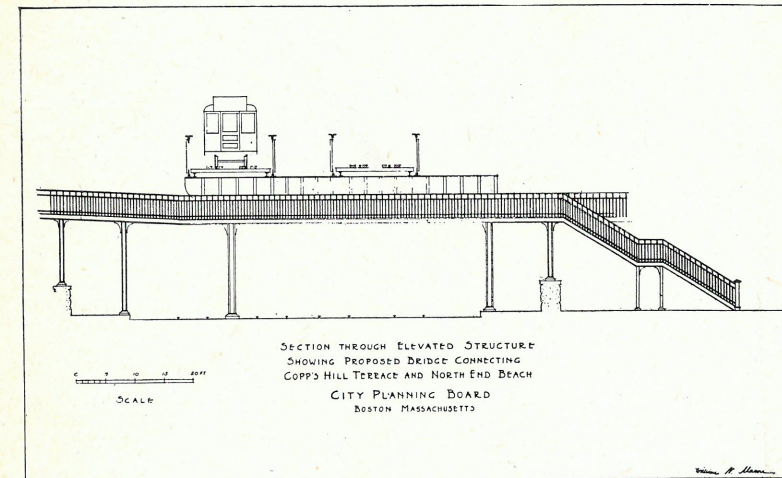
DETAIL DRAWING OF BRIDGE AND ELEVATED WALK FROM COPPS HILL TERRACES TO THE NORTH END BEACH.
